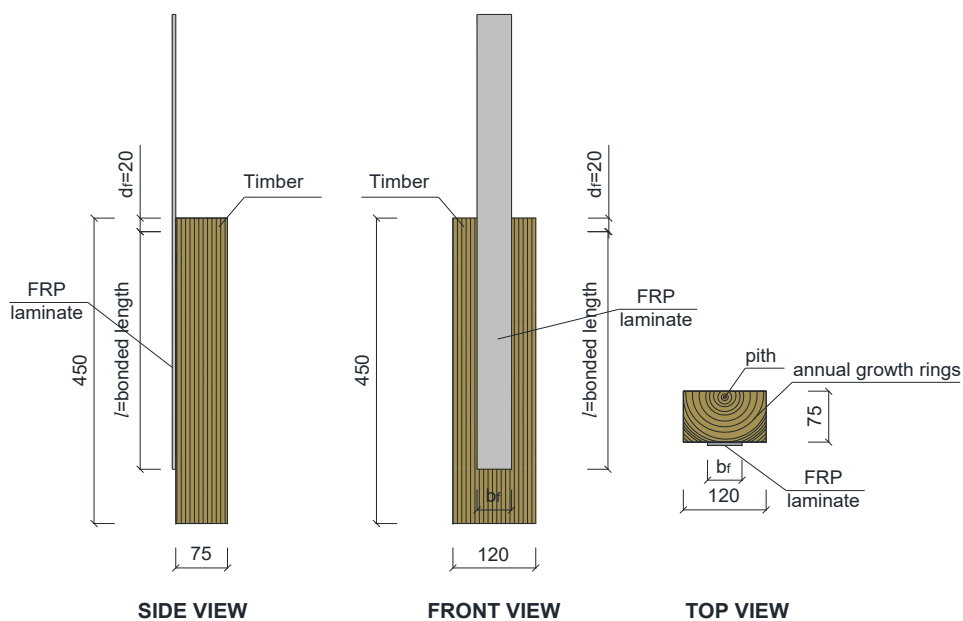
Specimen Dimensions and Details of Bonded FRP system (FRP-to-timber specimens). Dimensions in mm.
